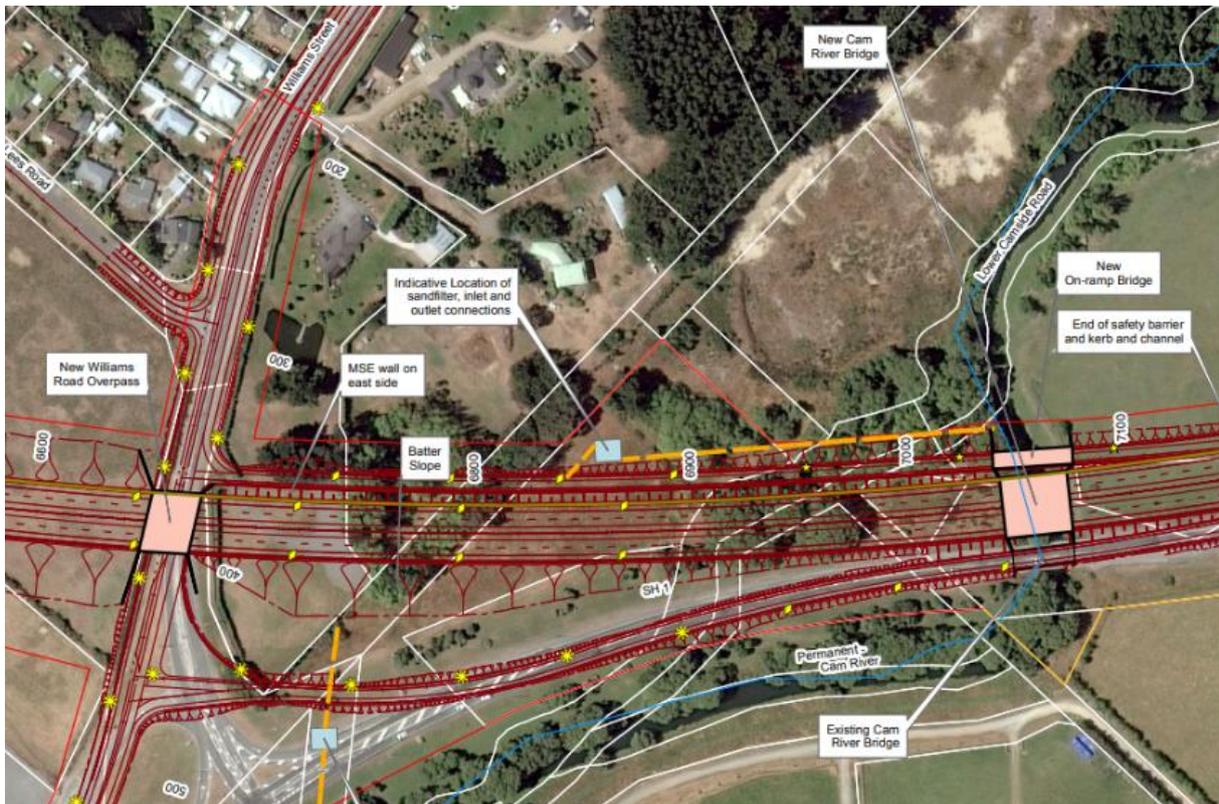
2013 Scheme Design at Cam River Bridge
